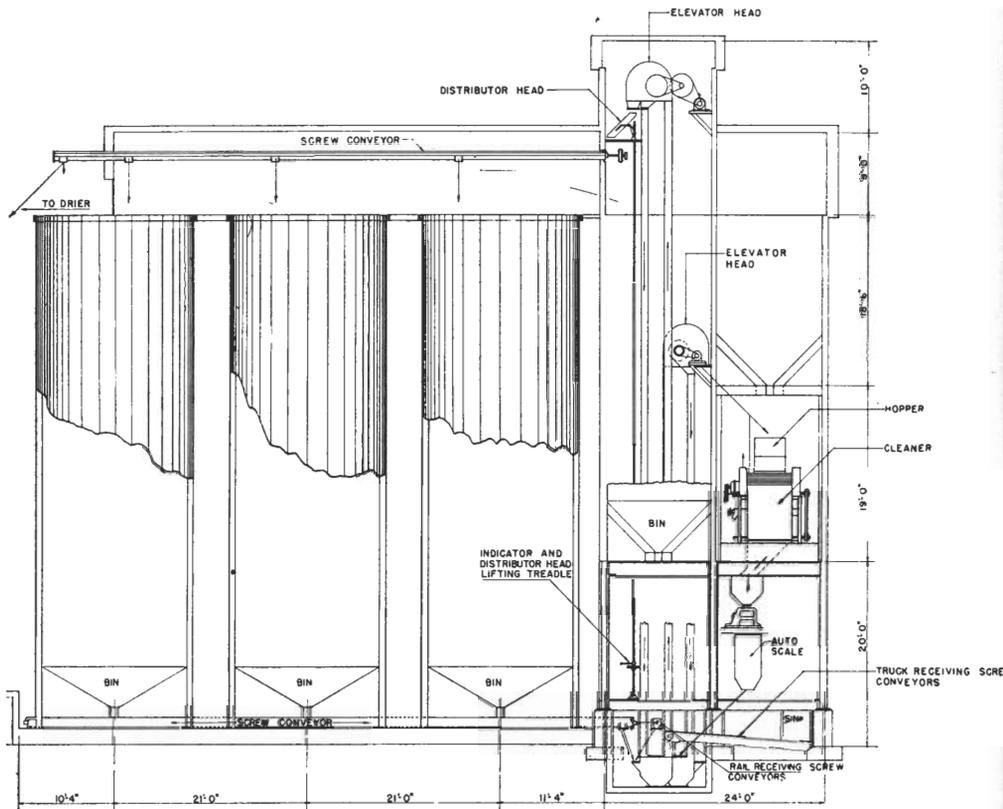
SCHEMATIC ELEVATION OF THE ELEVATOR SHOWN IN FIG 6
